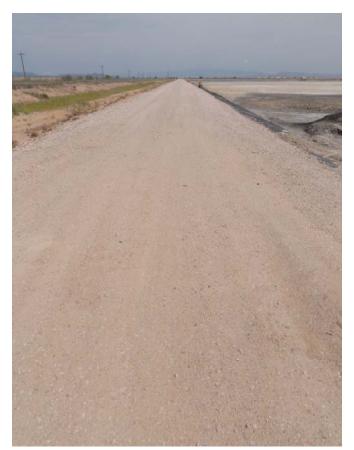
Crest of west embankment of Scrubber Sludge Pond 1, looking north.
